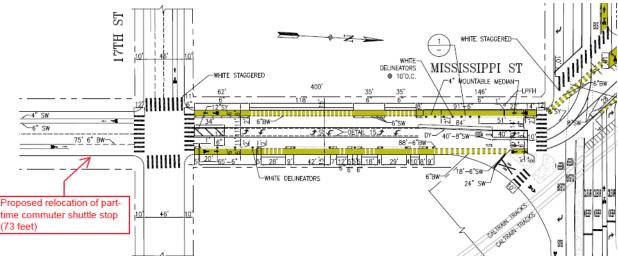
Mississippi Street from 16th Street to 17th Street – Proposed Condition
